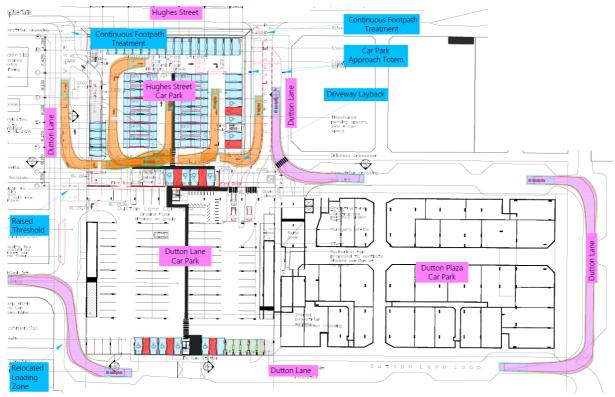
Proposed Car Park Ground Floor Circulation – Service Vehicles
